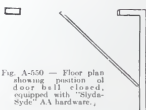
Floor plan showing door in closed position, equipped with "SlydaSyde" AA hardware.
